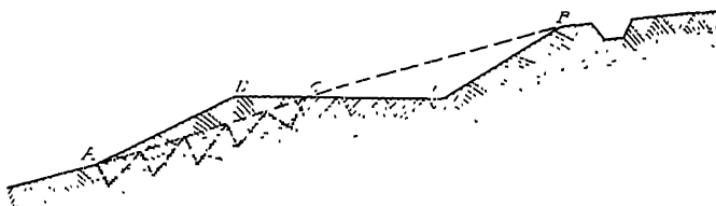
Section of Embankment Showing Reinforcing by Means of Steps
